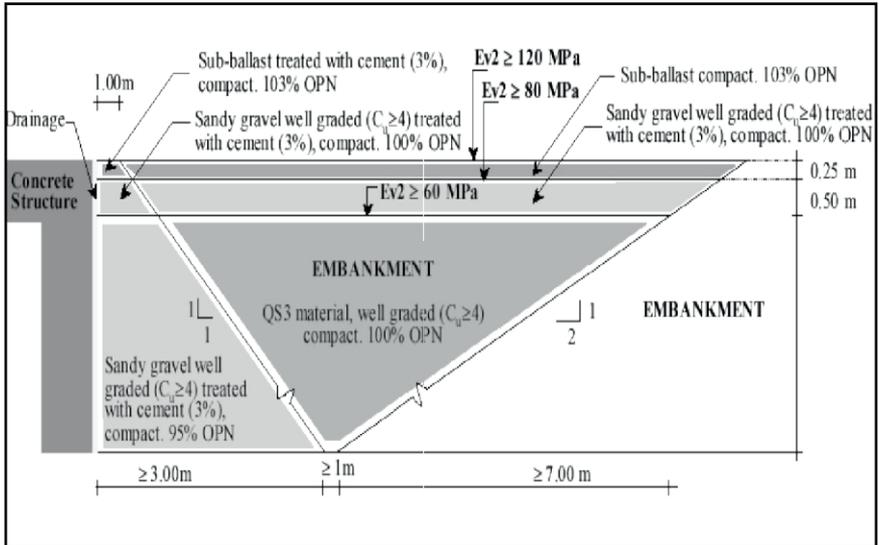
Typical Longitudinal section of Embankment – Bridge transition
